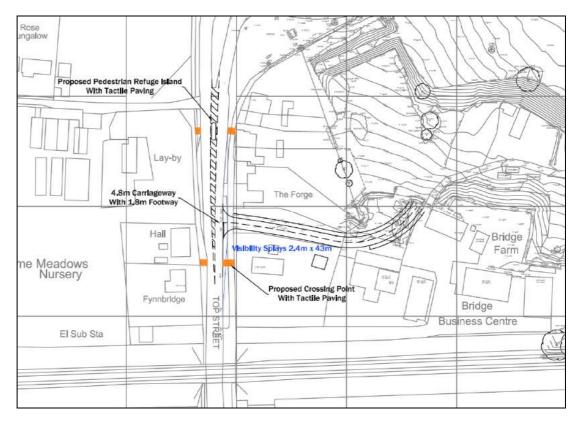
Proposed Site Access Arrangement (Access off Top Street)
